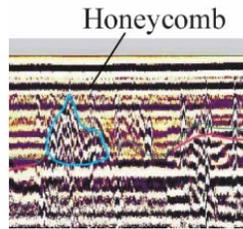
GPR image showing honeycombed concrete (Parkinson and Ekes, 2008)
